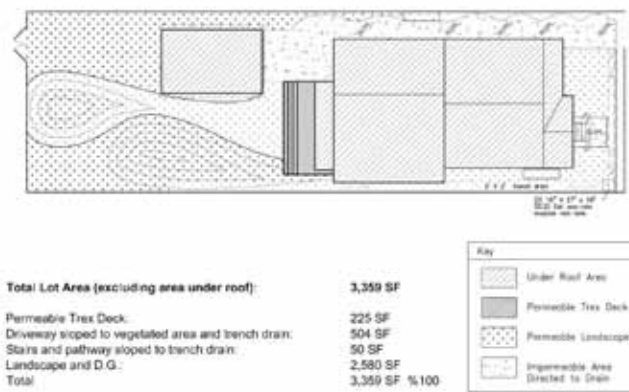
Site plan for permeable surfaces and runoff flow direction. Measures were taken to infiltrate onsite and offsite runoff, such as the installation of trench drains, EcoRain boxes, and swales, the removal of concrete, and the use of Trex decking.
